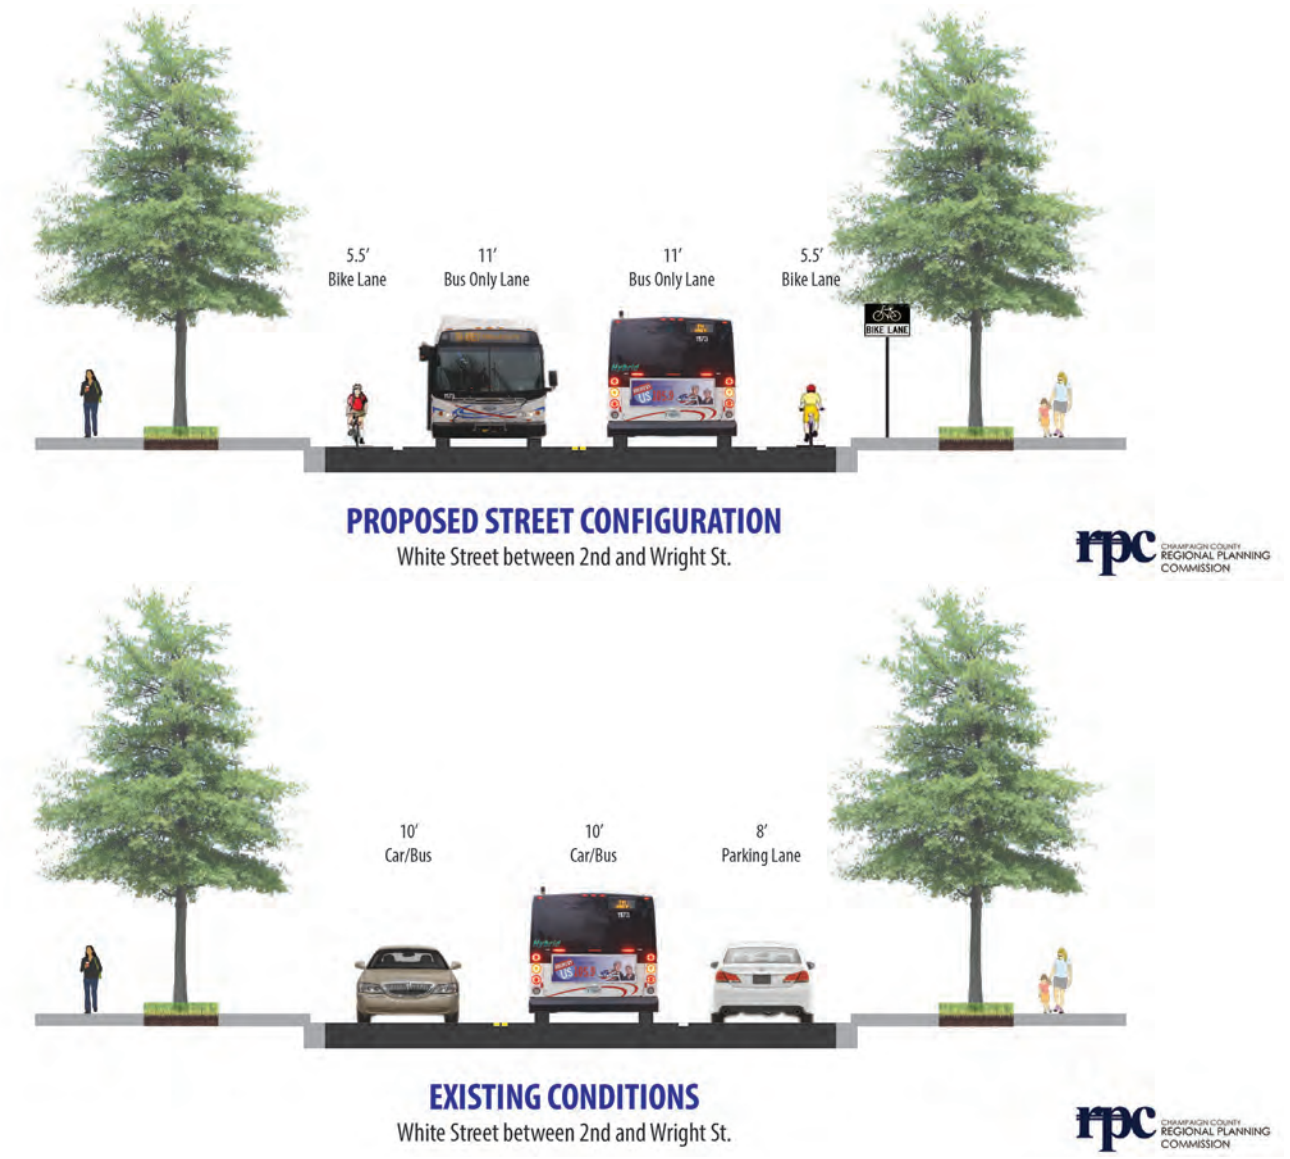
Existing and Proposed Lane Configurations for White Street
